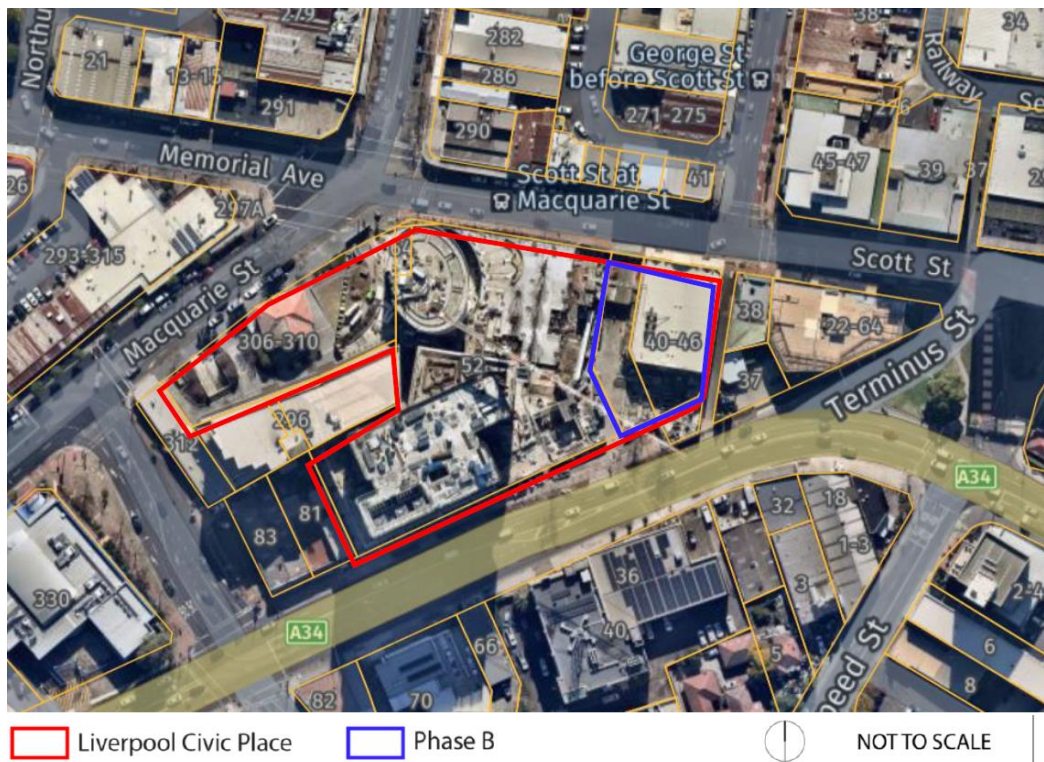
Site Aerial (Site B in blue being the land to which this application applies)
